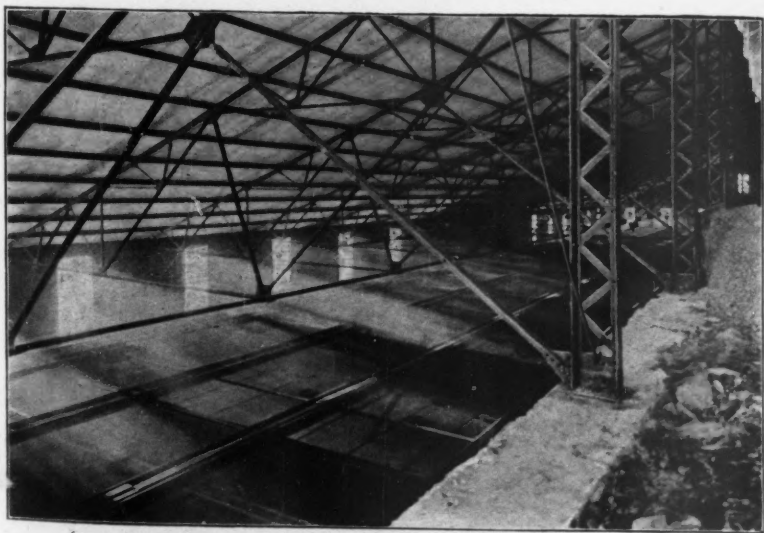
TANK ROOM, SHOWING EMPTY TANKS.
